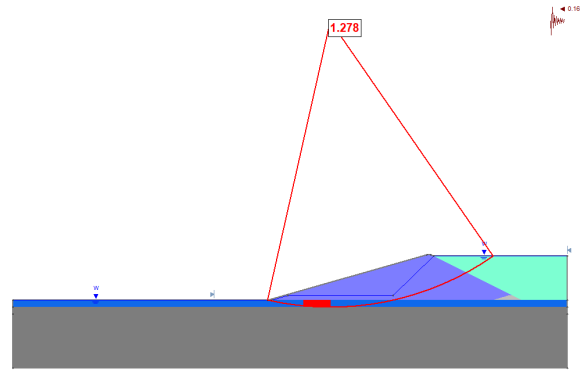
Slope stability, JGC shear panels improvement, analysis seismic loading, and drained behavior.
